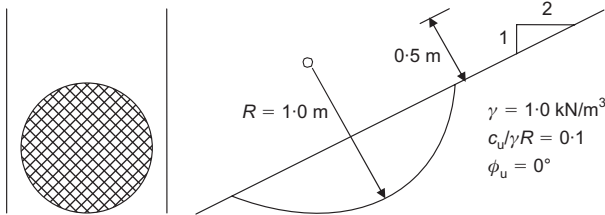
Plan and section of 3D failure surface in purely cohesive slope as reported by Baligh & Azzouz (1975)
